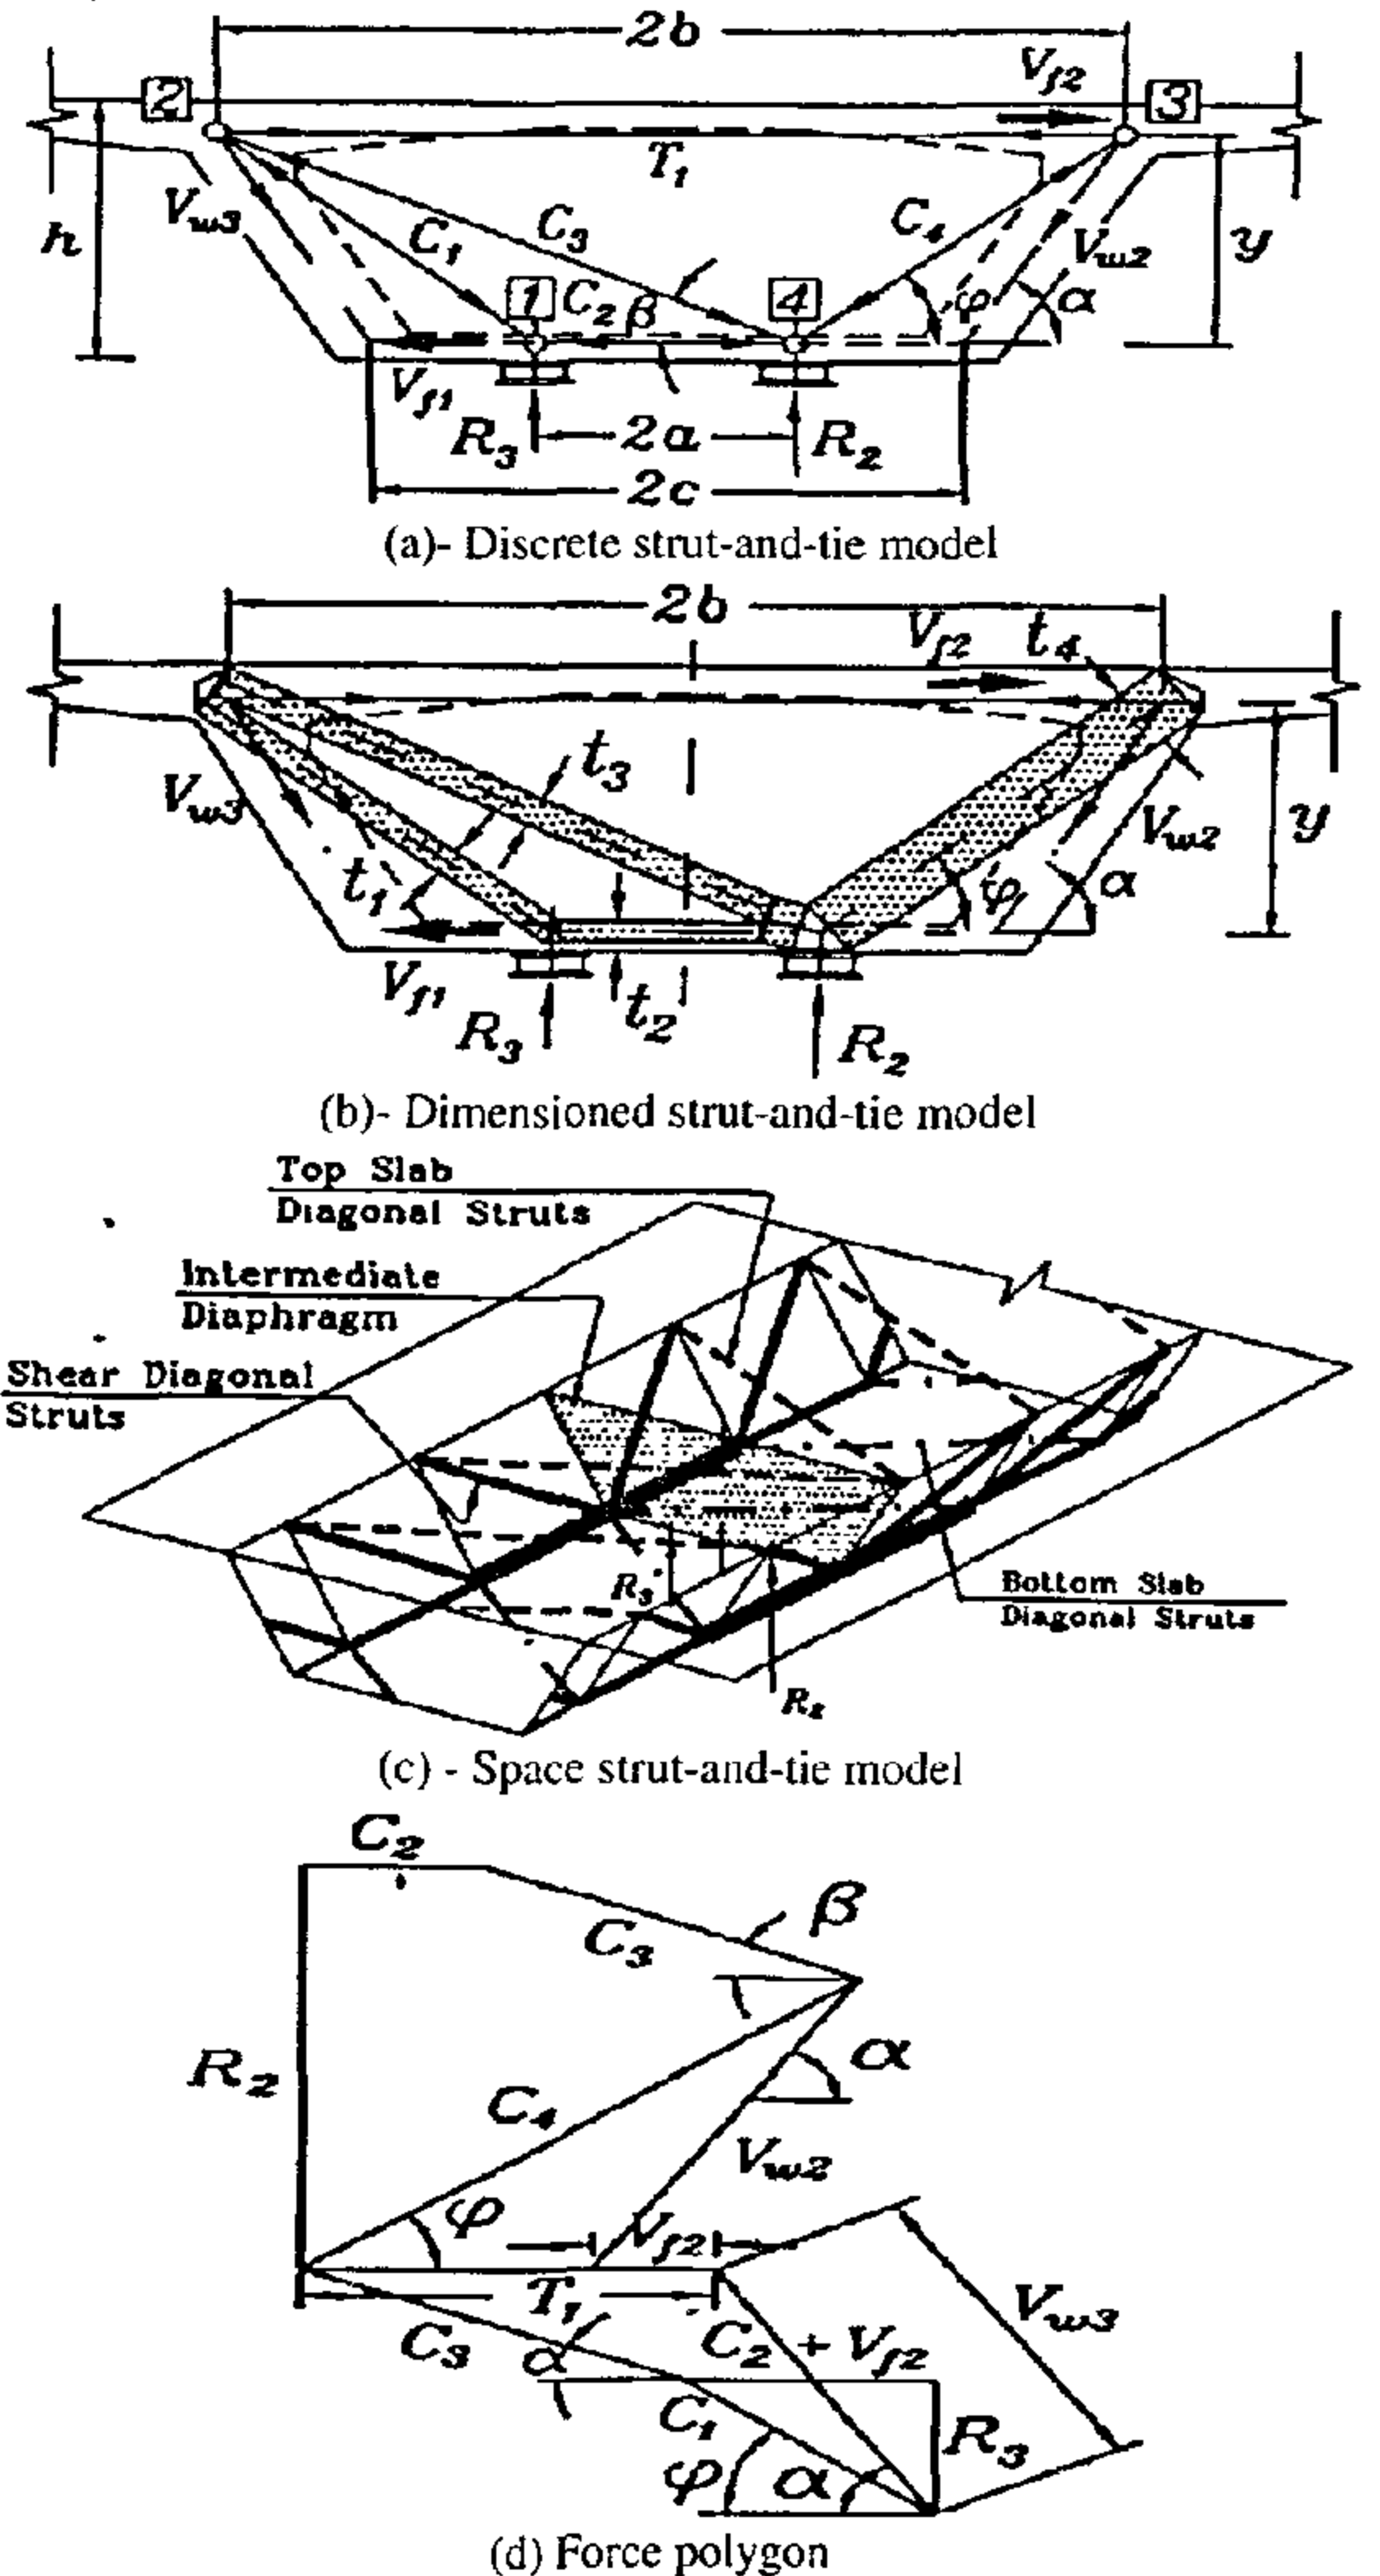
Strut and tie model for a box-girder diaphragm under maximum eccentric loading
